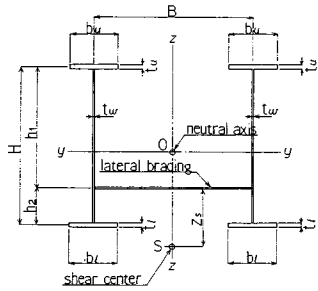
Cross-Section of I-Girder Bridge with Lateral Bracing.
